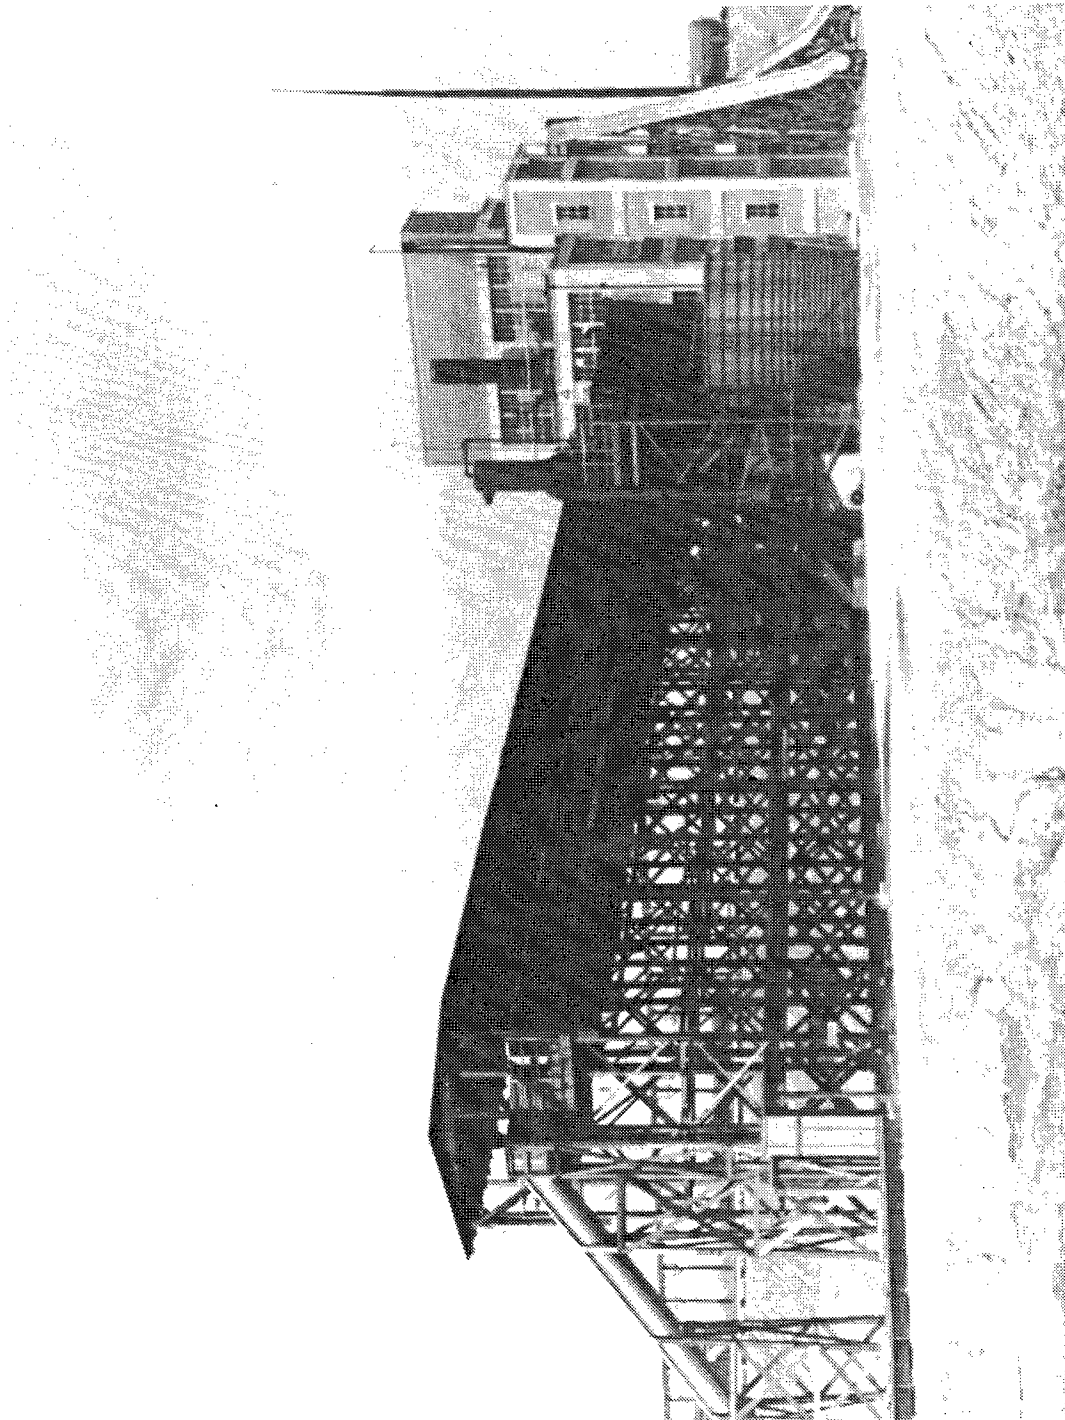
D Building with Reactor Leg, Area B (courtesy of Holston AAP Photo Set No. 20-B [on file Engineering Vault, Building 26]).
